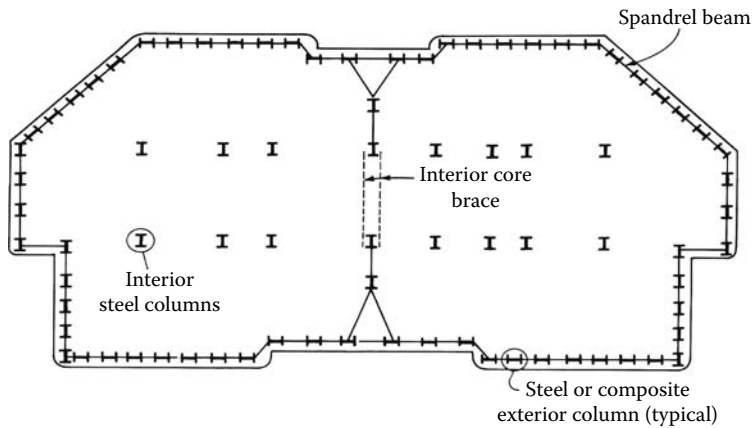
Framed tube with 10 and 15 ft column spacing.
